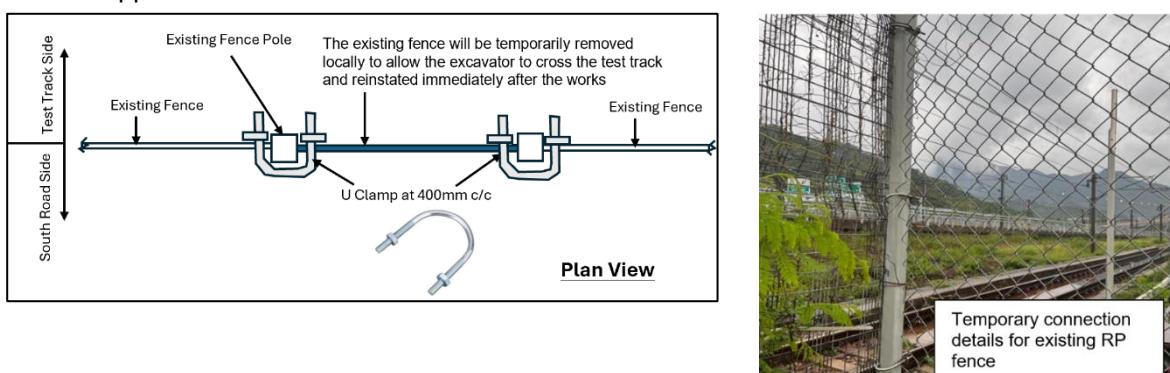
Temporary Connection Details for Existing RP Fence
